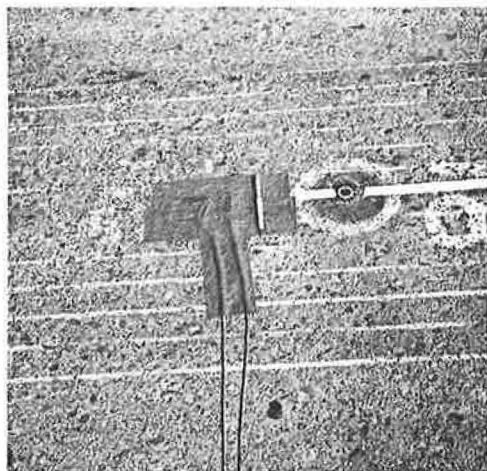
SR-4 pavement strain and LVDT deflection gage installations at Shell Ave. test road at Martinez.
